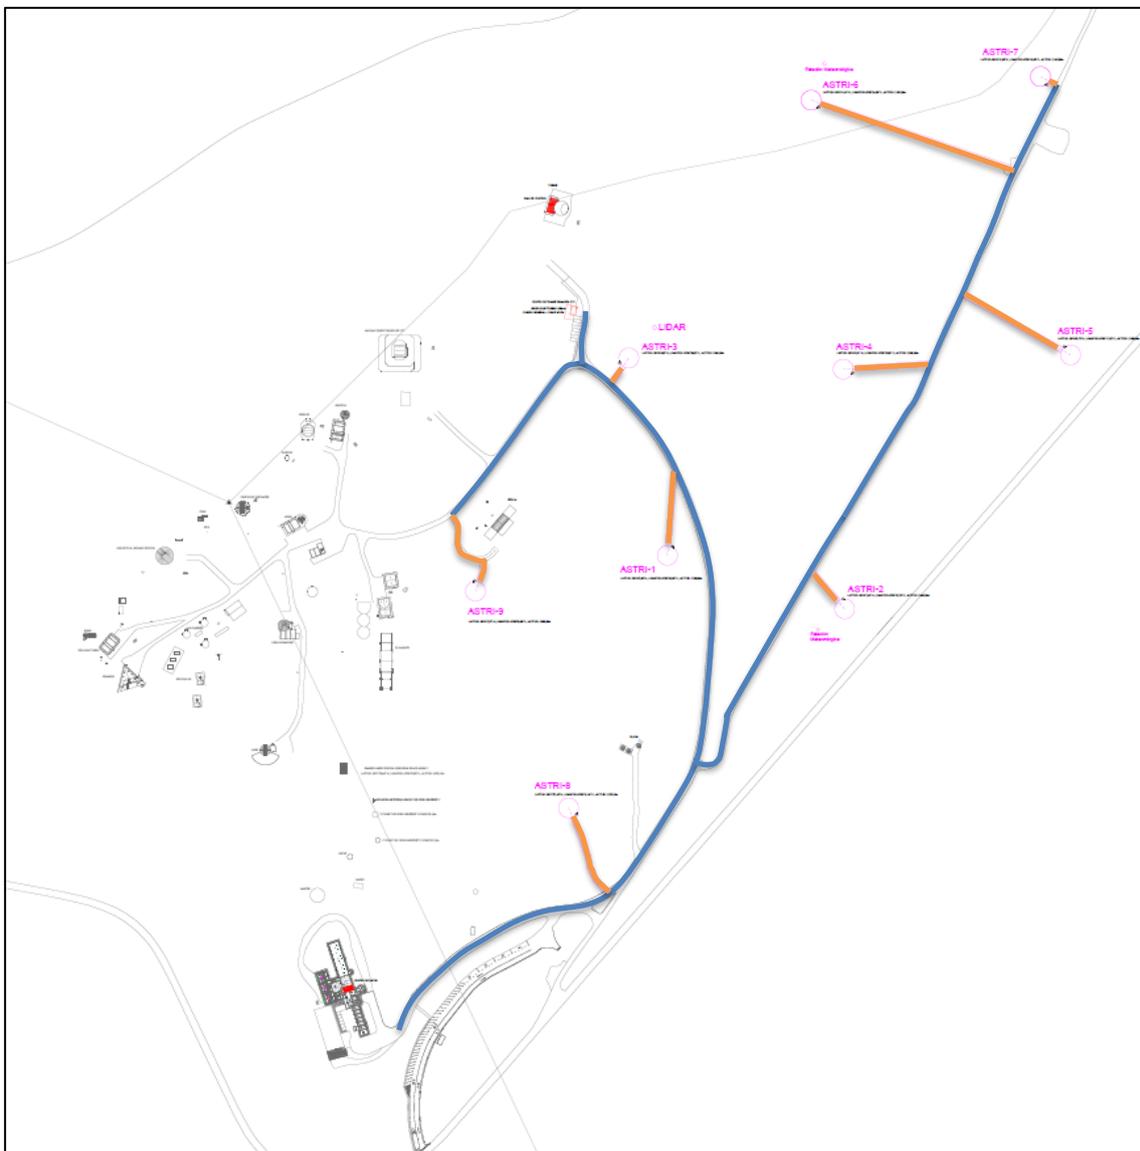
ASTRI Mini-Array roads layout. Blue lines are existing roads/paths, yellow lines are the new access roads to the telescopes
